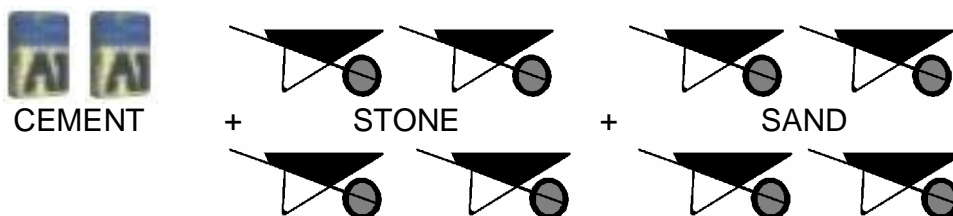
RECOMMENDED FOUNDATION CONCRETE MIX
